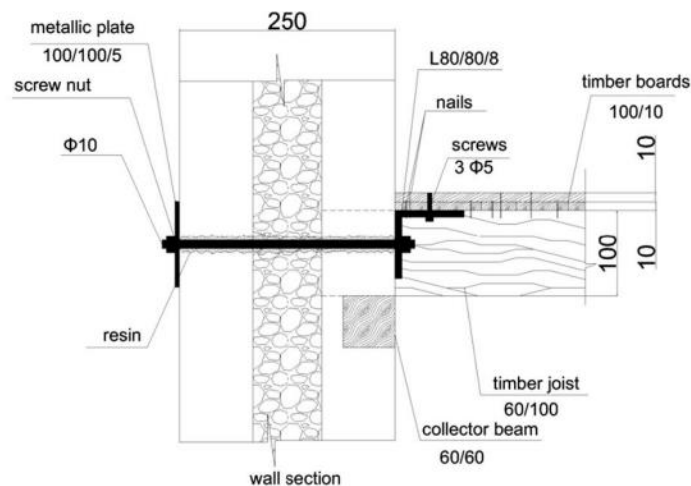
Wall to timber floor strengthened connection detailing.
